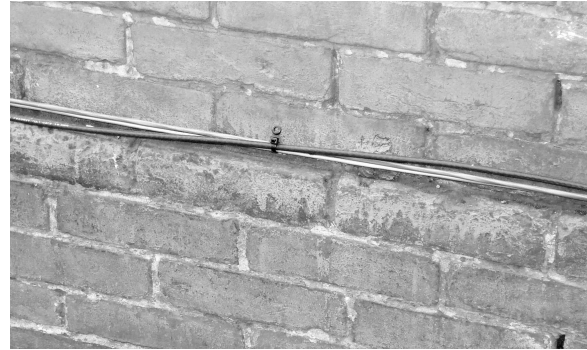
Utility wires should not be mounted on the surfaces of buildings in the Scenic and Historic District and in particular, wires should not be surface mounted on the facades of buildings.
